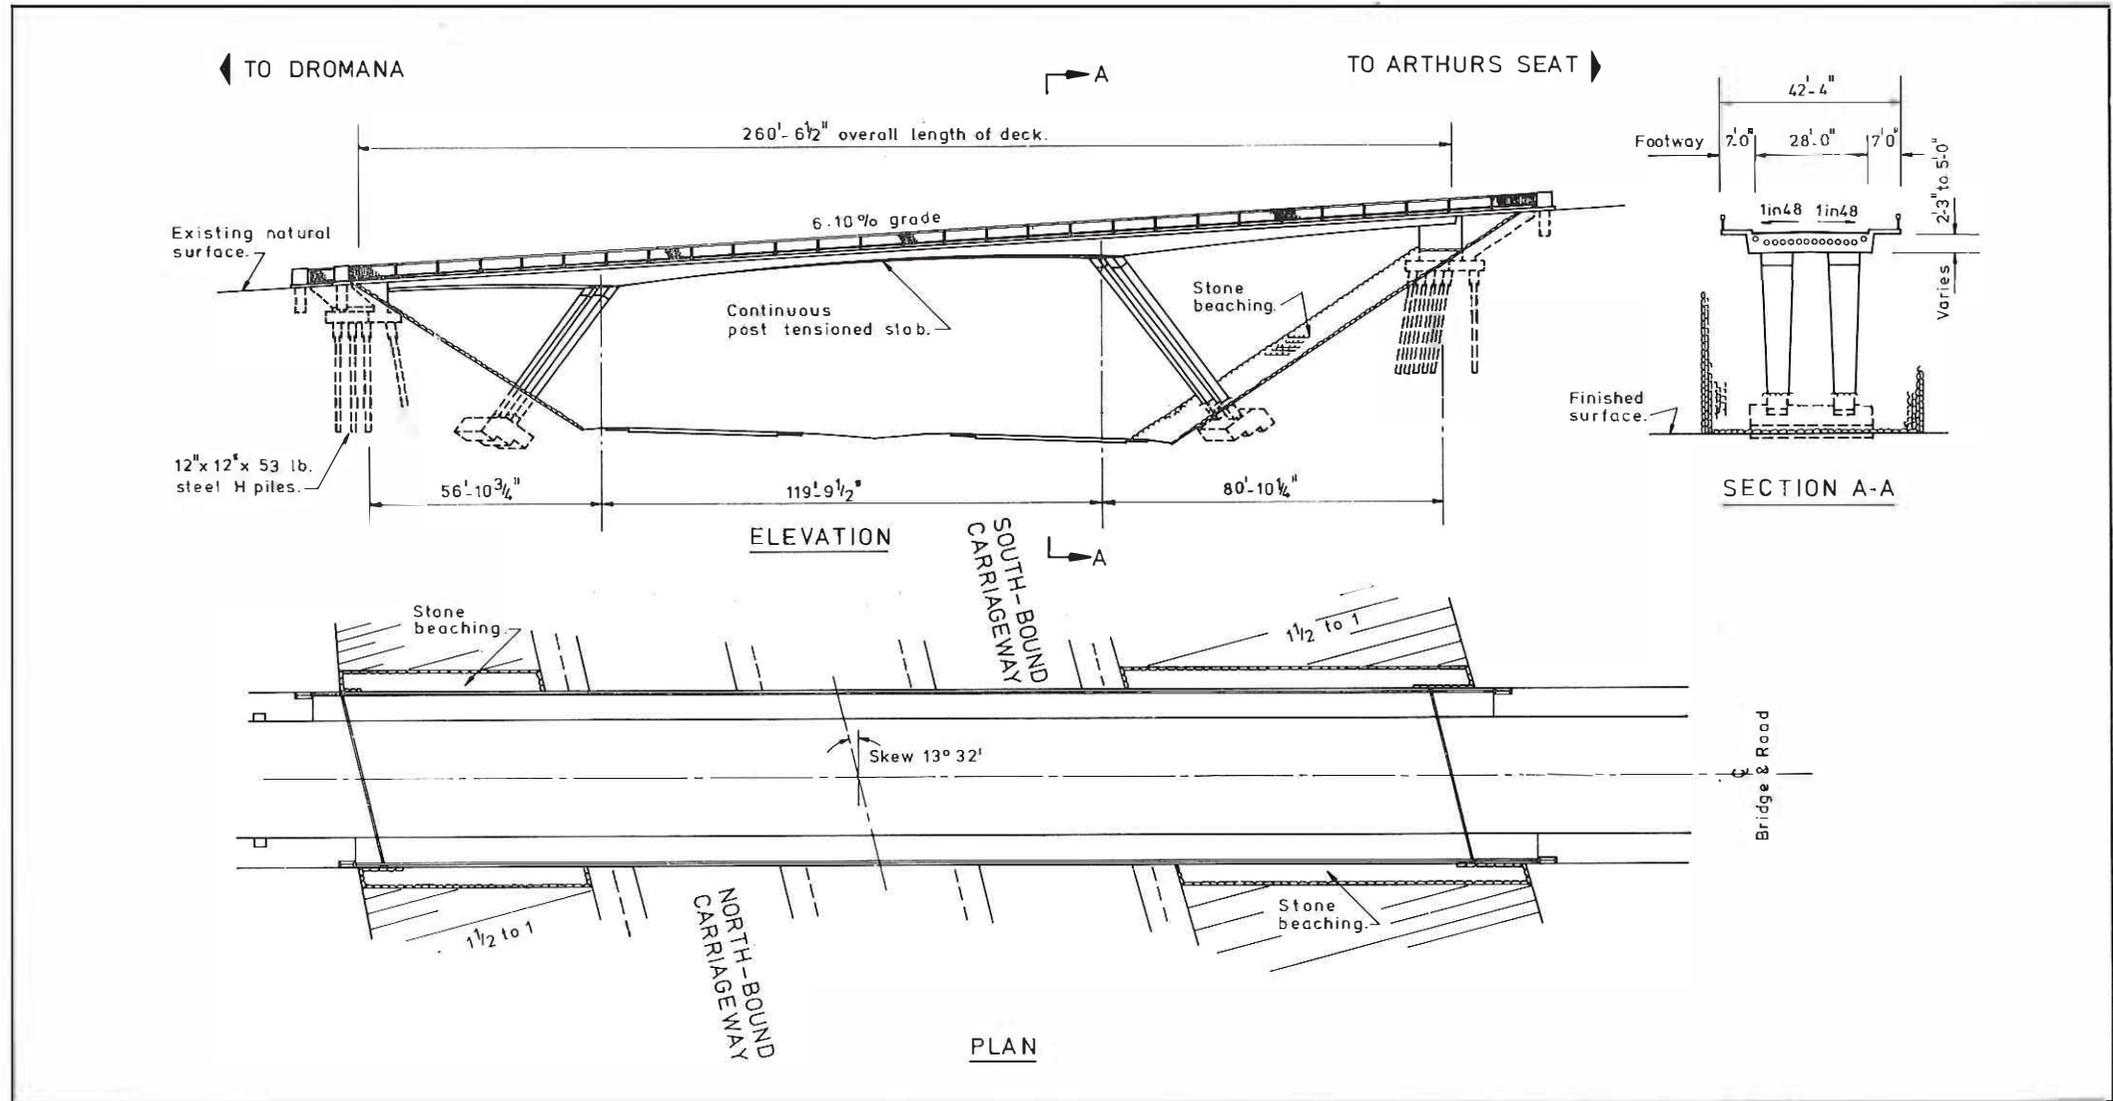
Burrell Road Bridge over the Mornington Peninsula Freeway.
